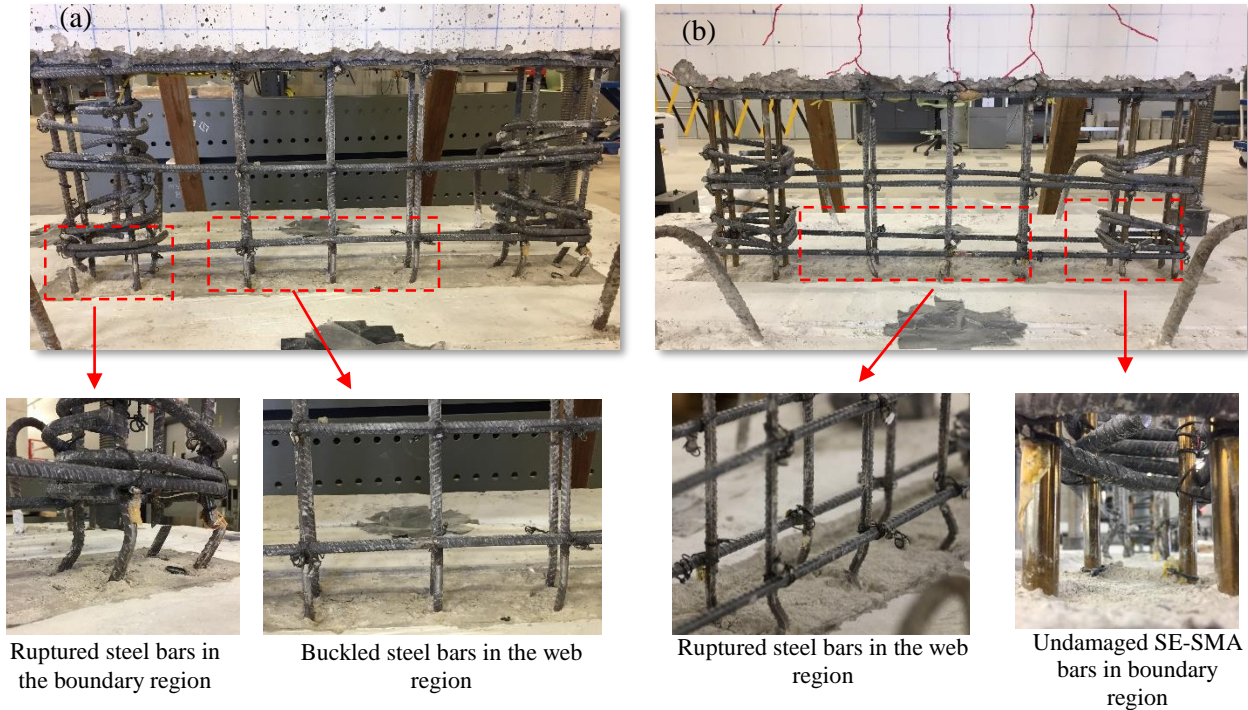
Concrete removal and damage of reinforcing bats: (a) SWS; (b) SWN
